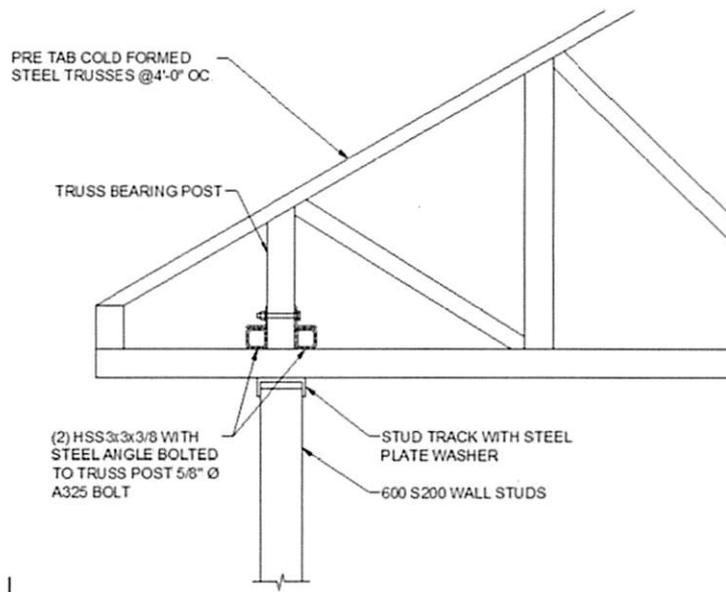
Exterior Load Bearing Wall Removal, With Window
